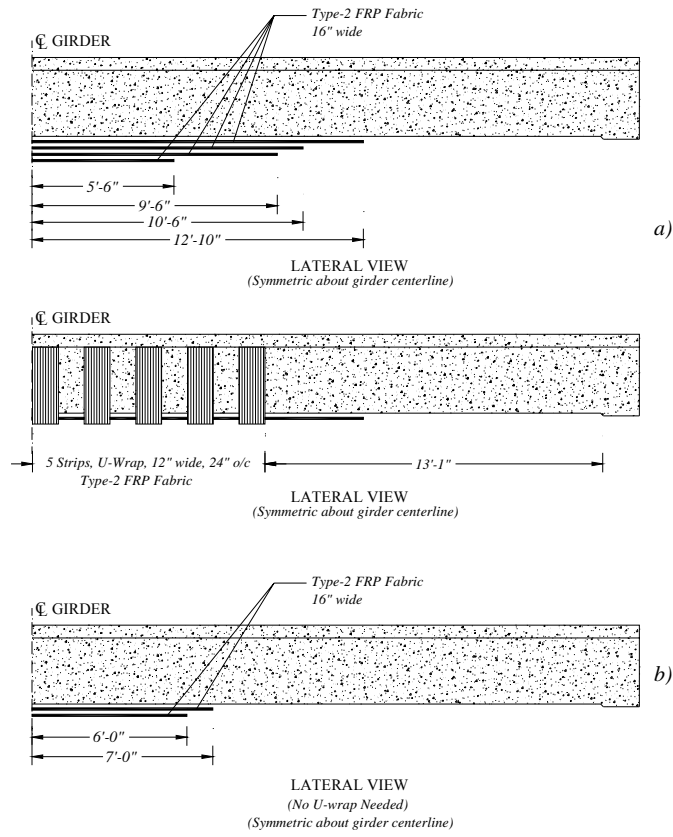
Type-2 FRP Flexural Reinforcement: a) Interior, and b) Exterior Girders
